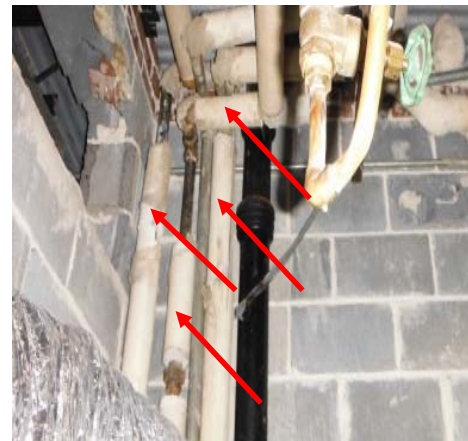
Asbestos-containing block TSI was observed in the basement level of the original house and above the ceiling in room 139 of the east wing.
